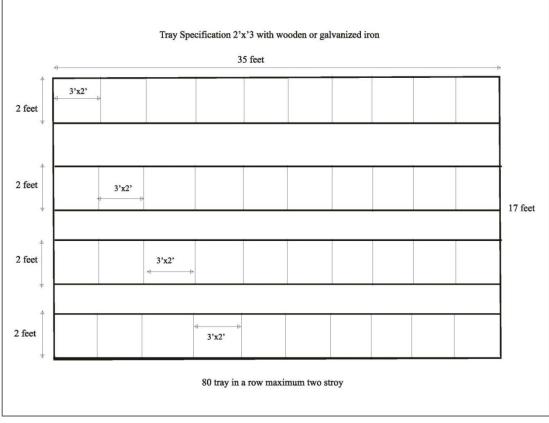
Specifications of Wooden/GI Trays Layout in Tunnel Dryer
